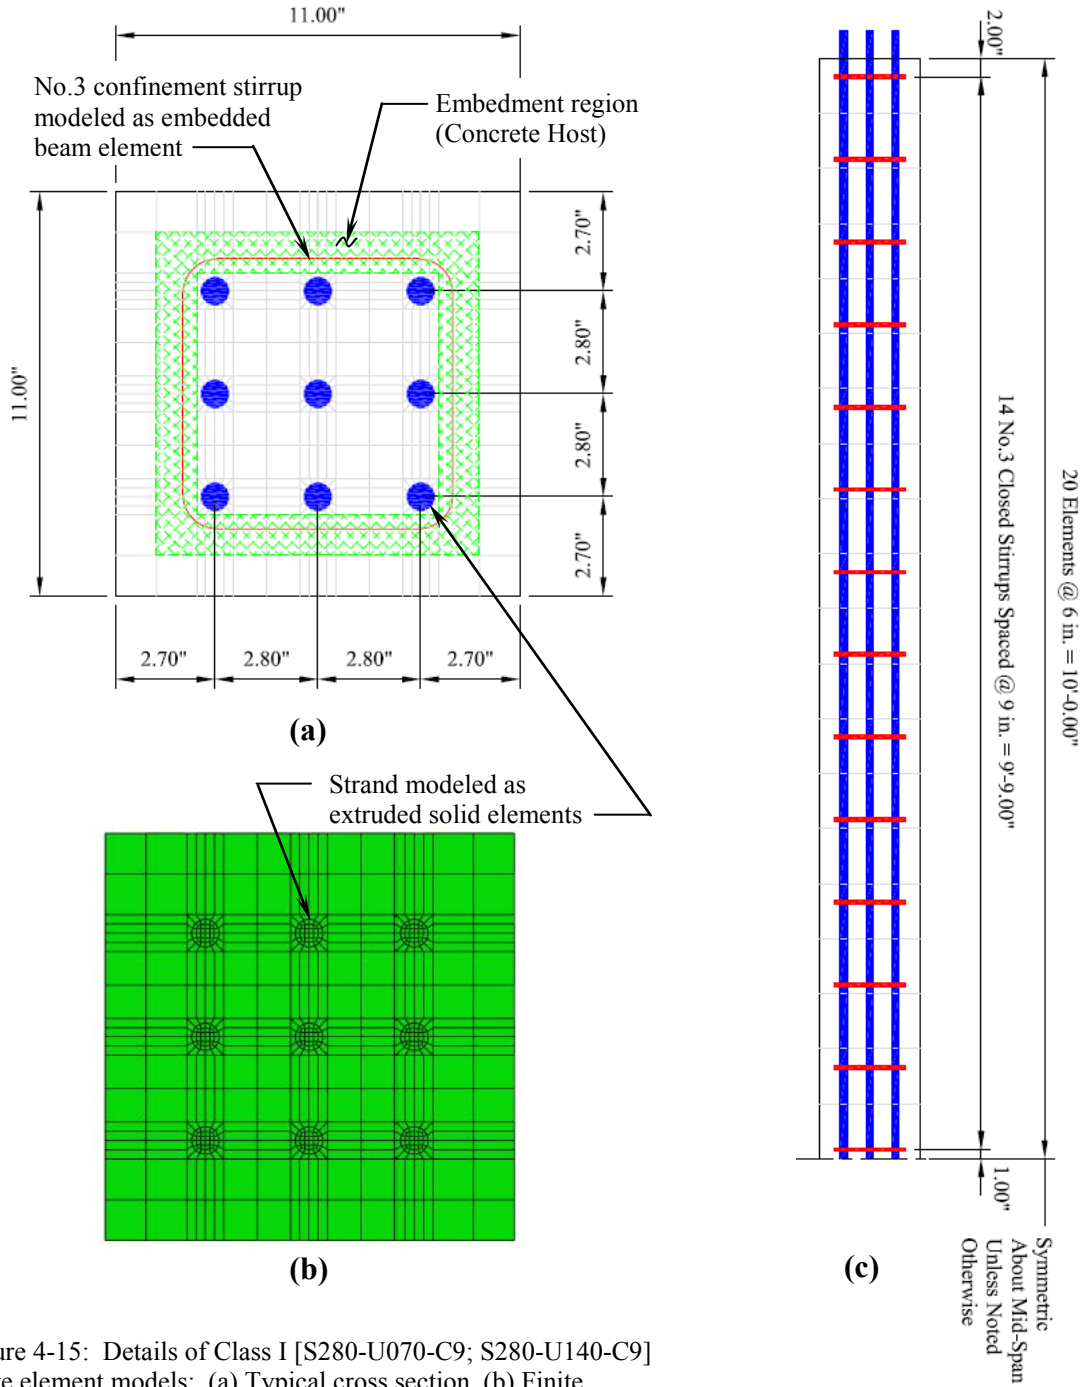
Details of Class I [S280-U070-C9; S280-U140-C9] finite element models: (a) Typical cross section, (b) Finite element simulation, and (c) Layout of confinement reinforcement (No.3 closed stirrups spaced at 9 in. on center)
